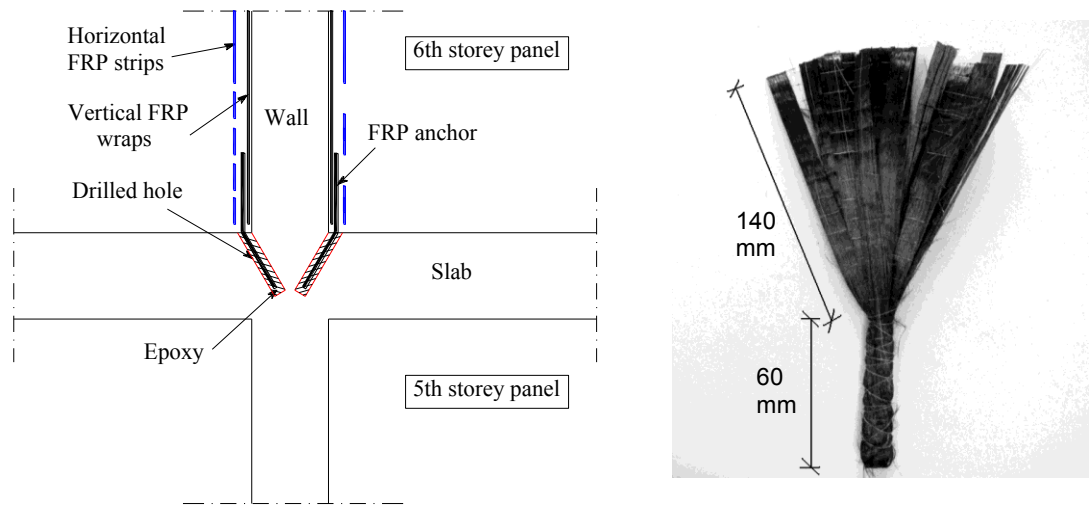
Detailing of a CFRP anchor for the first rehabilitated wall, W1R.
